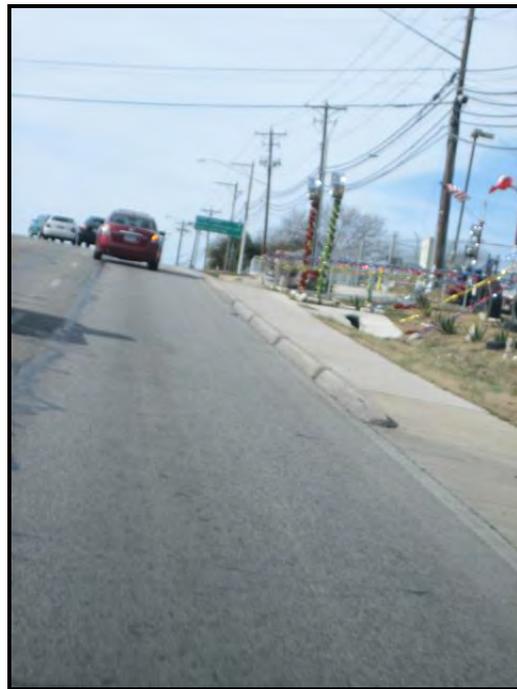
FM 969 Westbound (note sidewalk and drainage)
